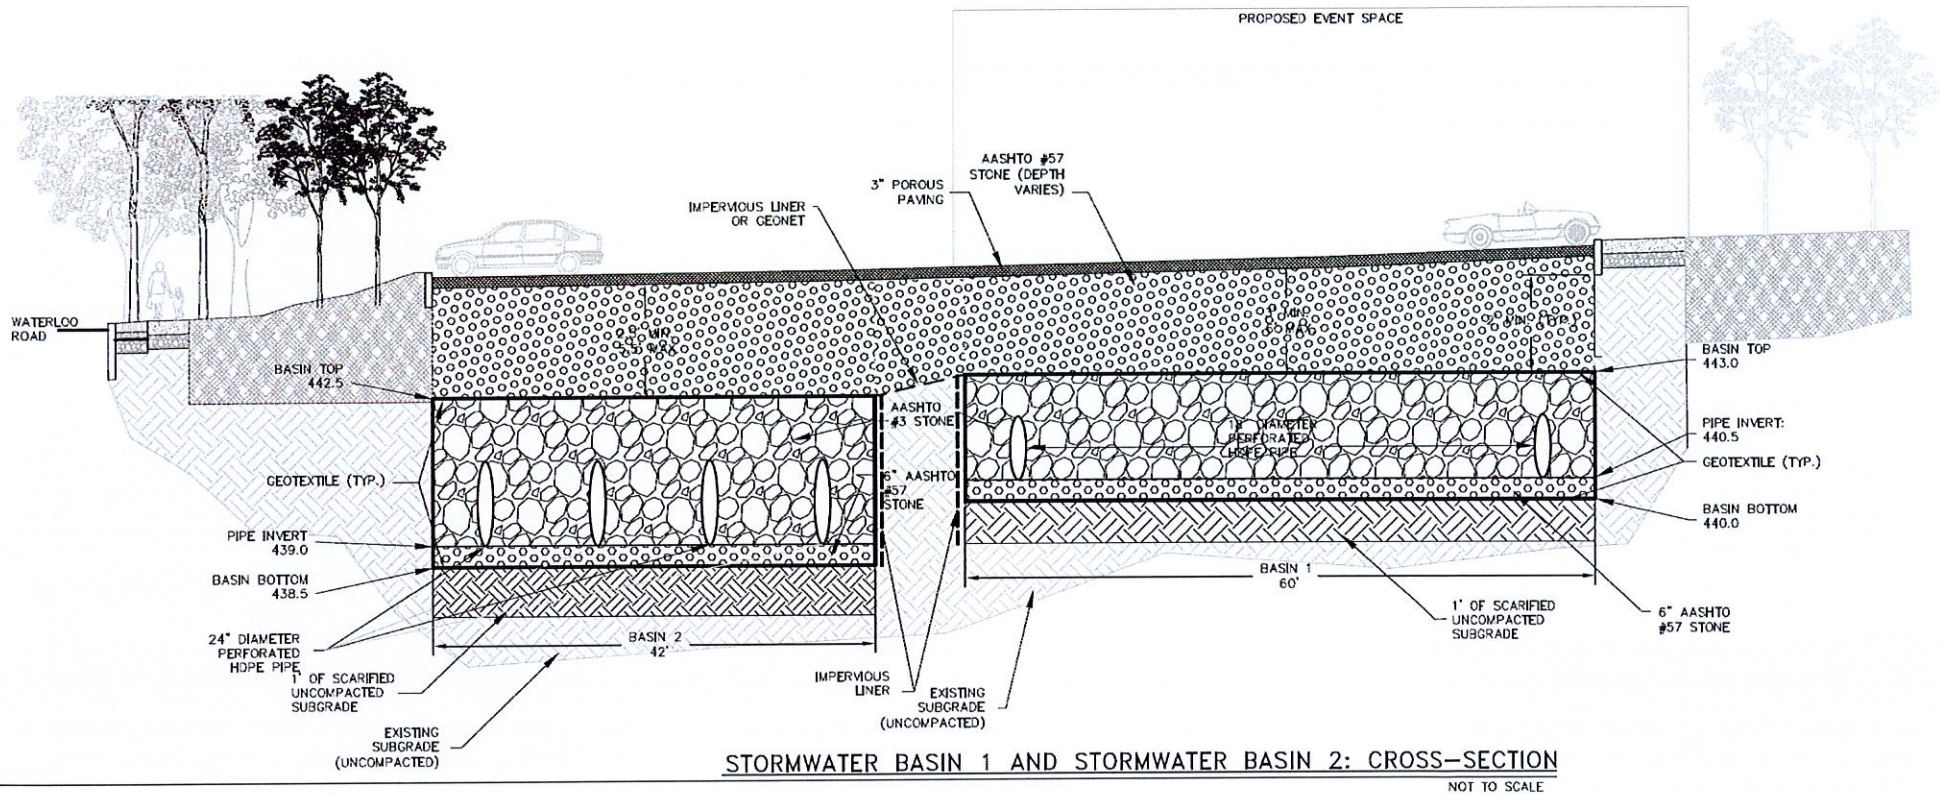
DEVON YARD POROUS PAVEMENT DETAIL FOR NORTHEAST PARKING LOT
